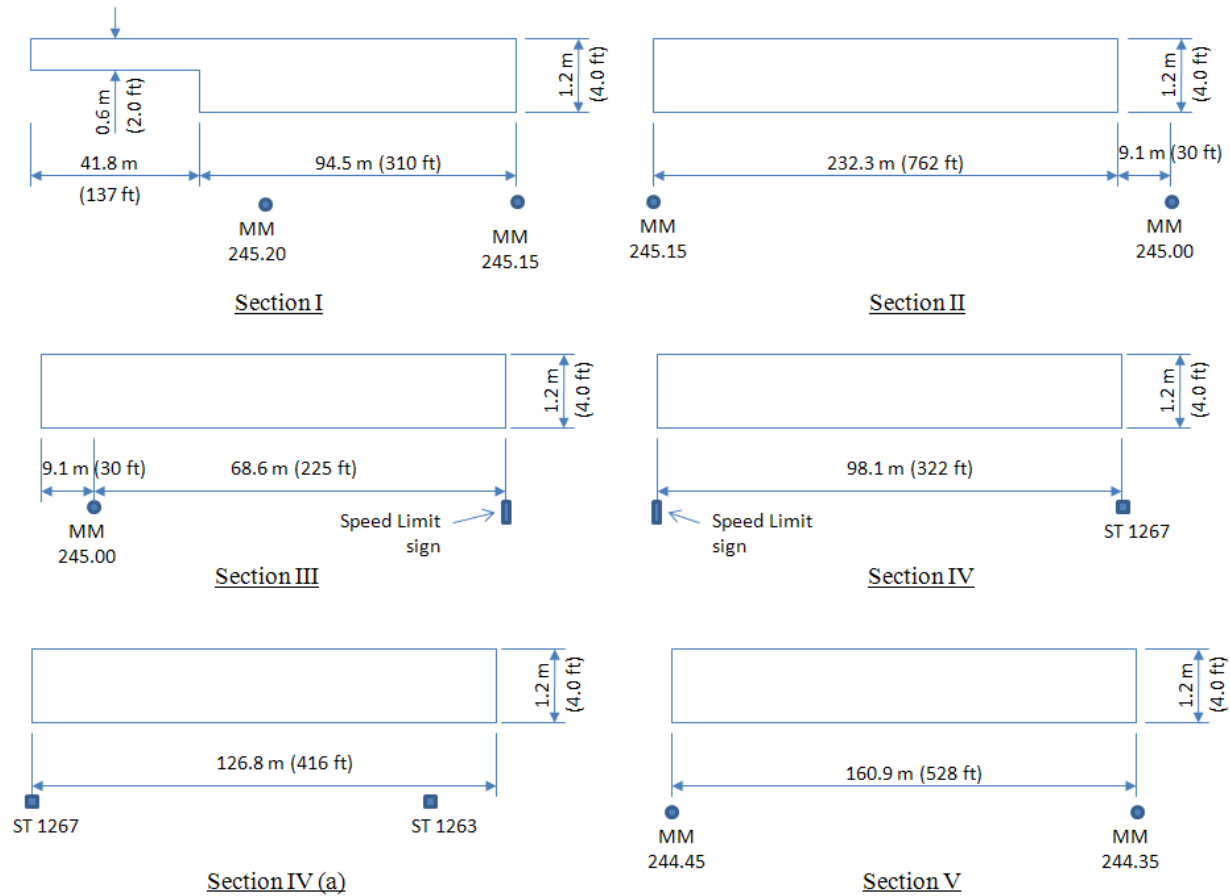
Details of test sections on westbound shoulder of US 20 (not to scale)
